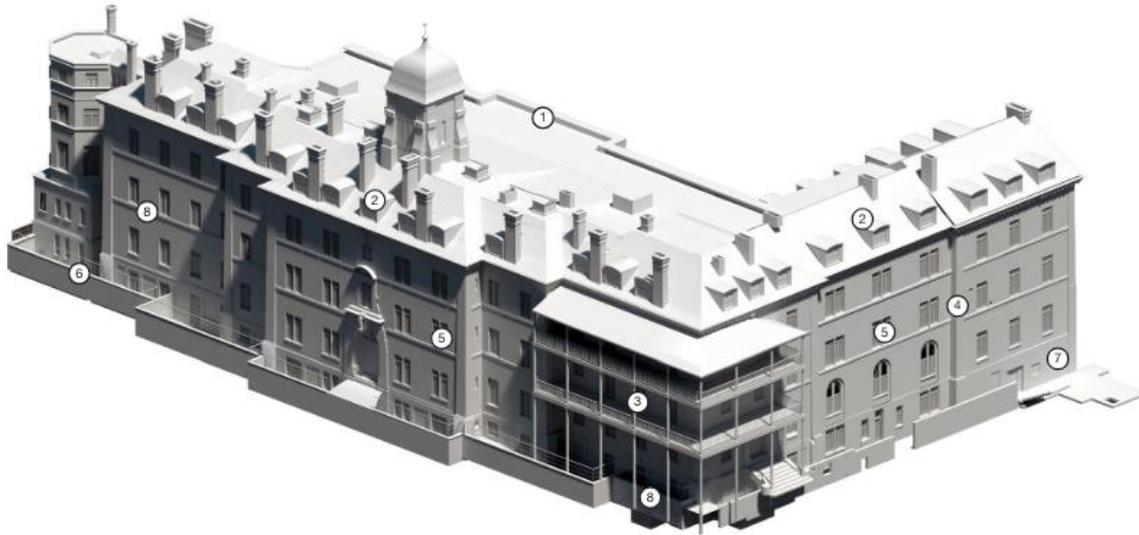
CGI of Building F to demonstrate proposed new dormers and roof works
